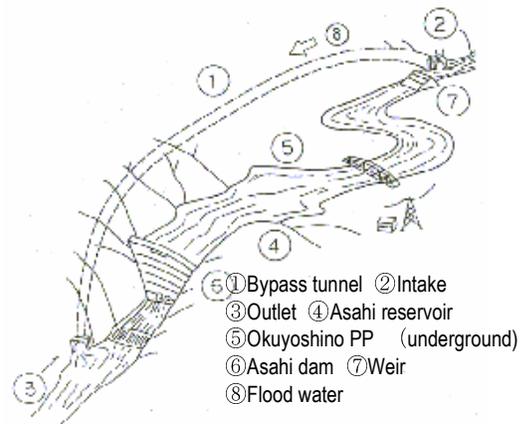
Outline of Asahi Dam sediment bypassing facilities (Source: Ref. No.1)
